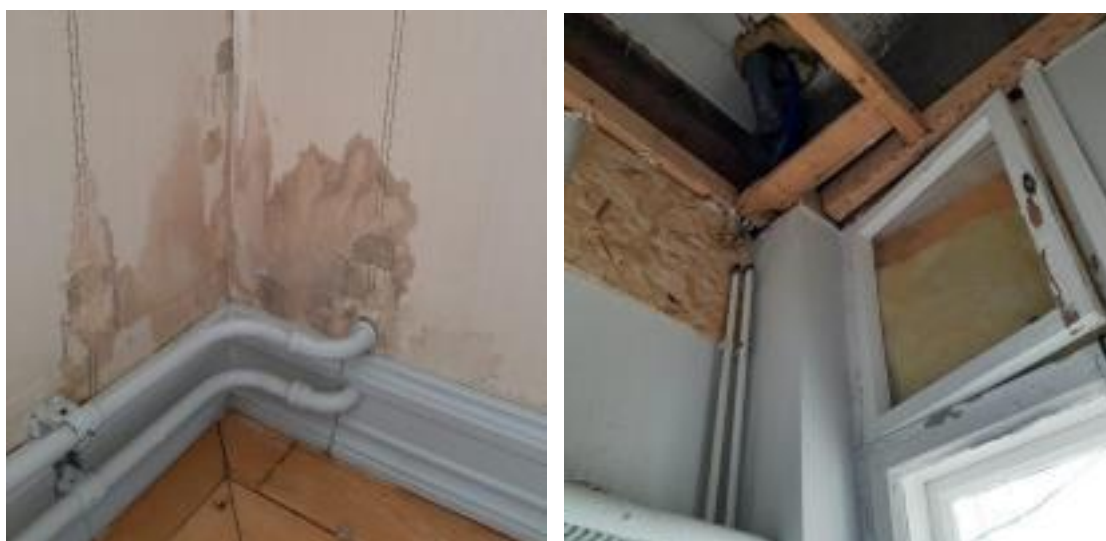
Moisture damage in the room behind the first floor toilet and toilet water pipes and insulated window
